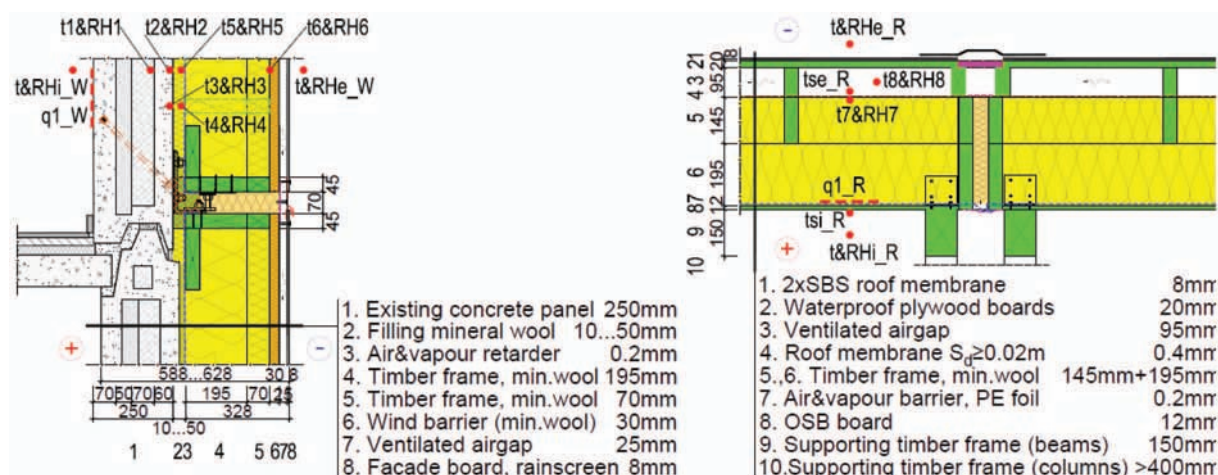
Designed solution of nZEB with analysed points. Installed prefabricated timber frame insulation elements on the wall type 1 (left) and on the roof type 1 (right).
